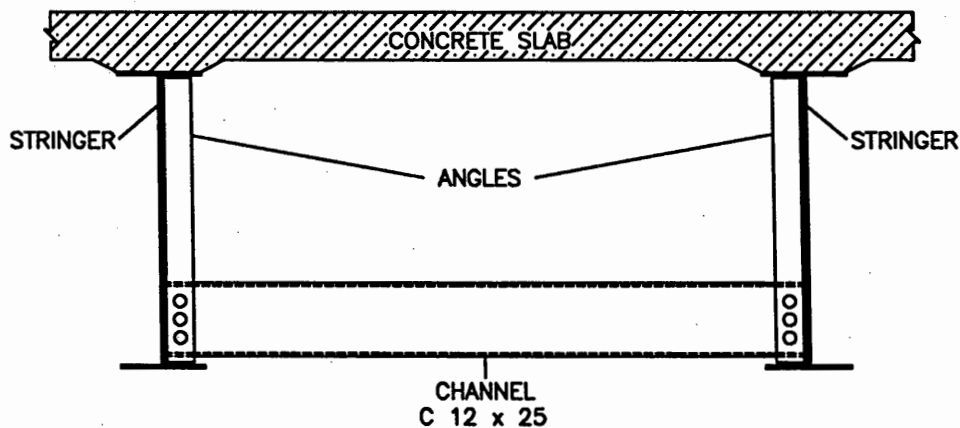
TYPICAL CHANNEL SECTION DIAPHRAGM AT MIDSPAN & QUARTER POINTS
